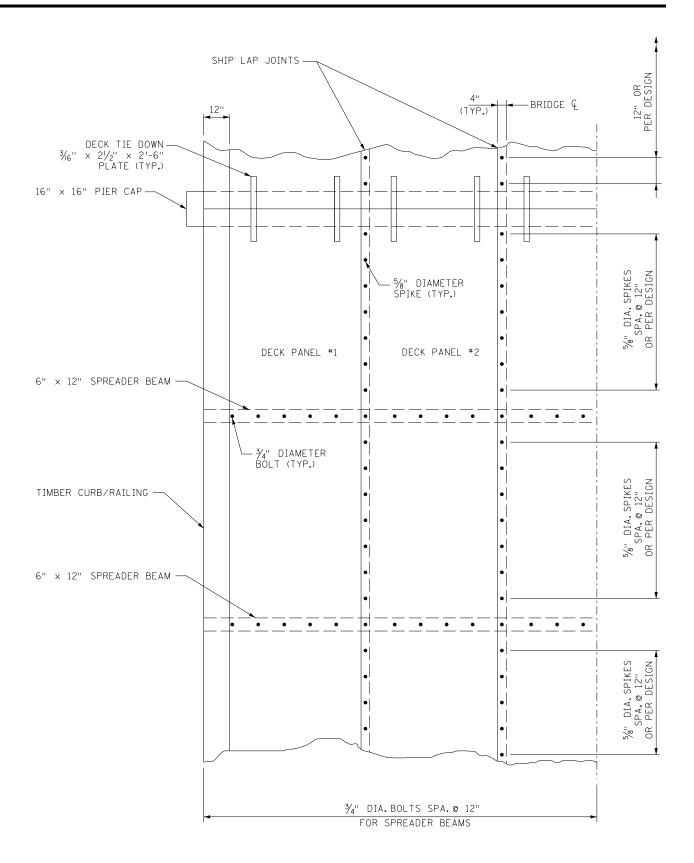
Longitudinal Timber Deck Partial Plan View
